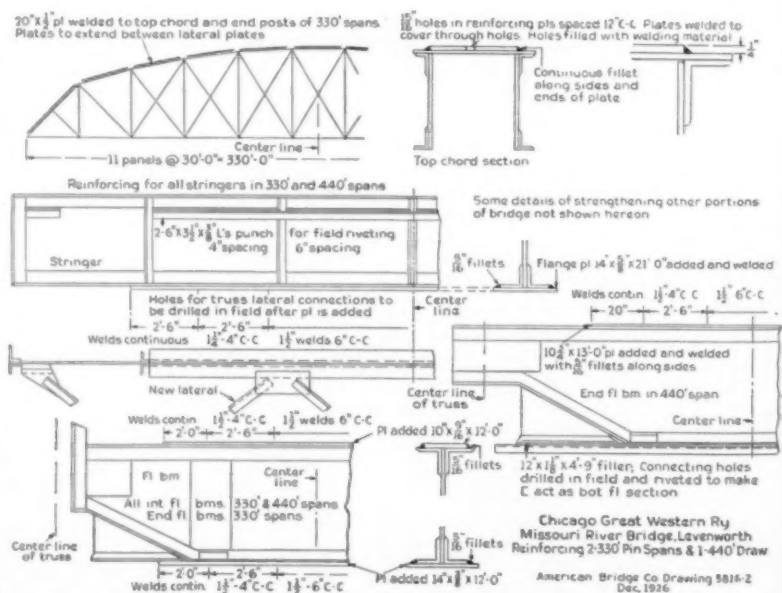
Reinforcing the Chicago Great Western Railway's Missouri River Bridge at Leavenworth, Kansas, by Welding
